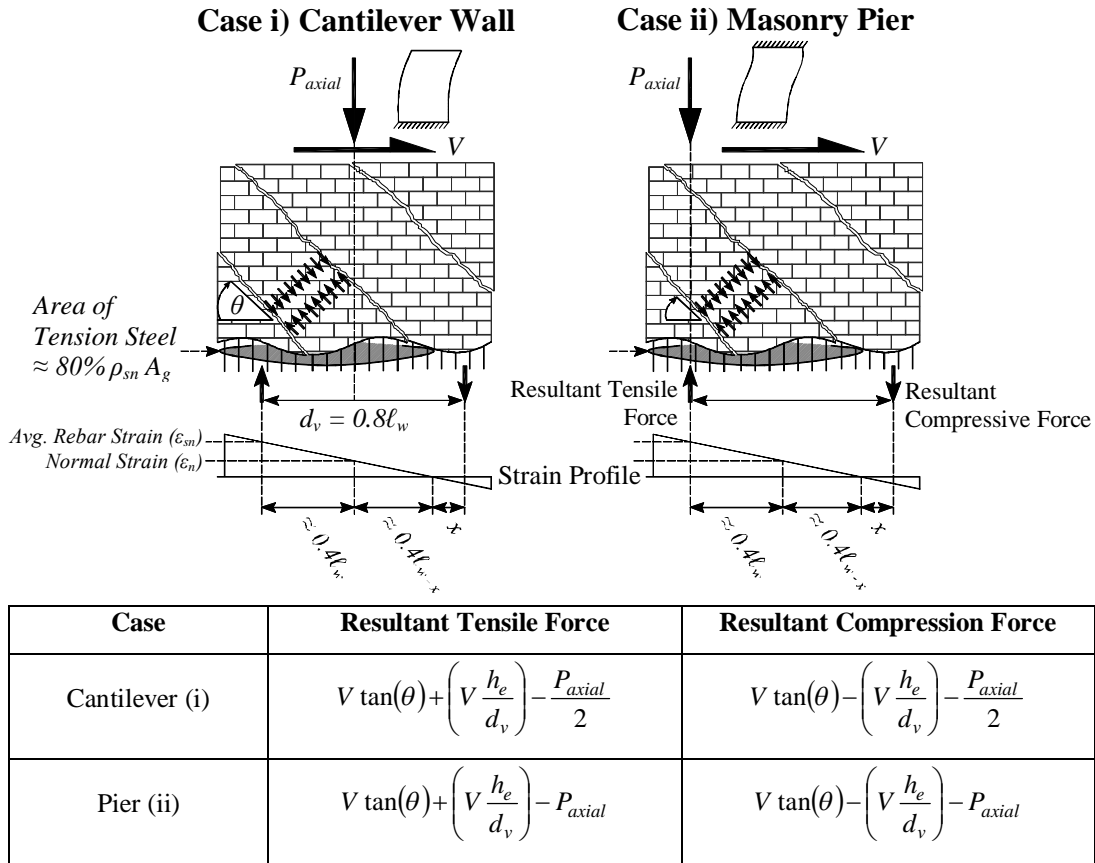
Normal Strain Conditions in a Masonry Cantilever Wall and Pier
